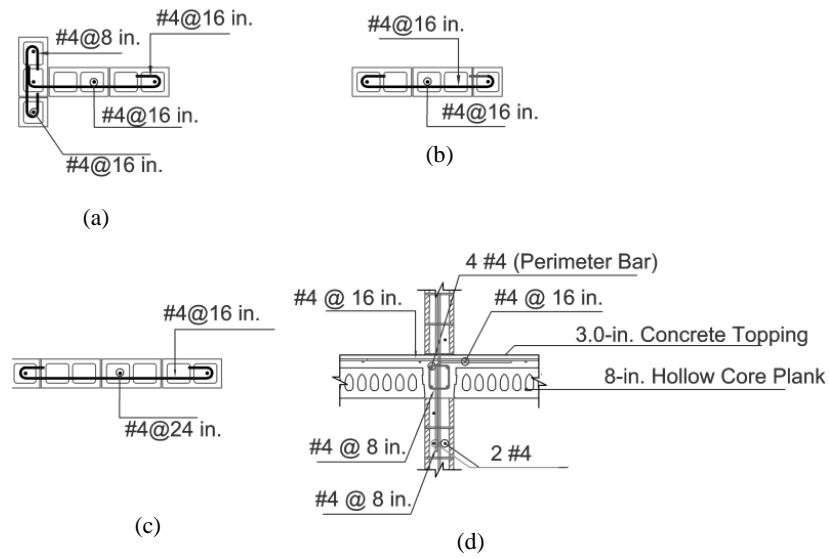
Cross-sections and reinforcing details of a) W-1 and W-3, b) W-2, c) W-4, W-6, W-7 and W-8, d) Slab and beam. (1 in. = 25.4 mm)
